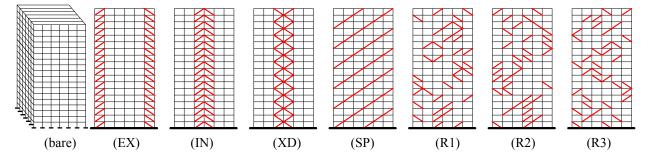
Bare 3D frame and façade layouts of the considered variants of the bracing system.
